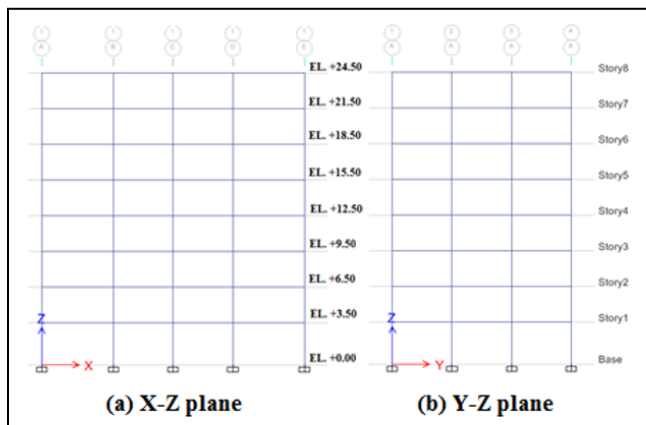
Elevation views of the building: (a) X-Z plane; (b) Y-Z plane.
